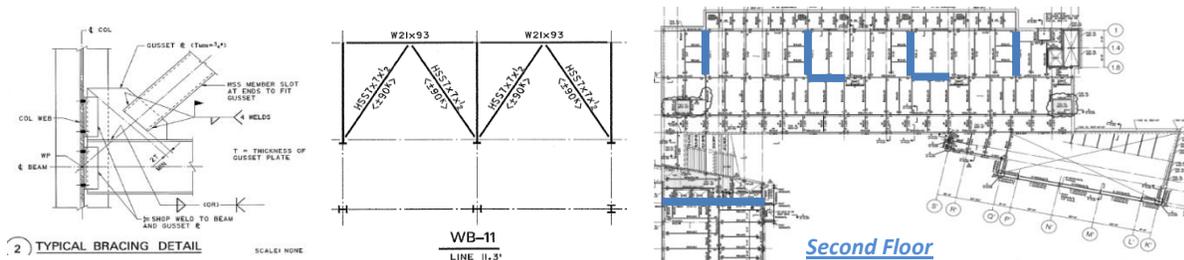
Typical bracing details and placement of bracing on 2nd Floor. Courtesy of RIT. Drawings not to scale.
